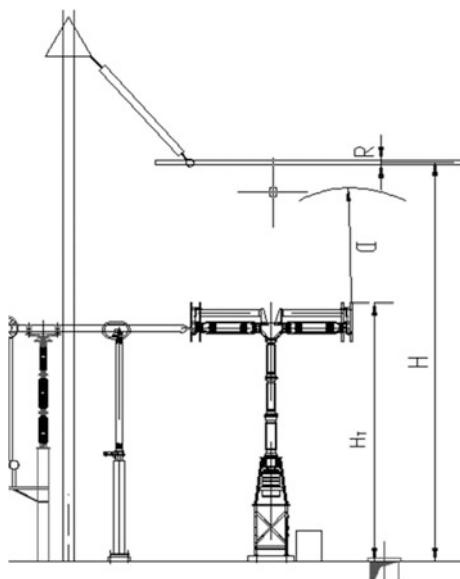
Typical profile of improved checkerboard-pattern layout (mm)
